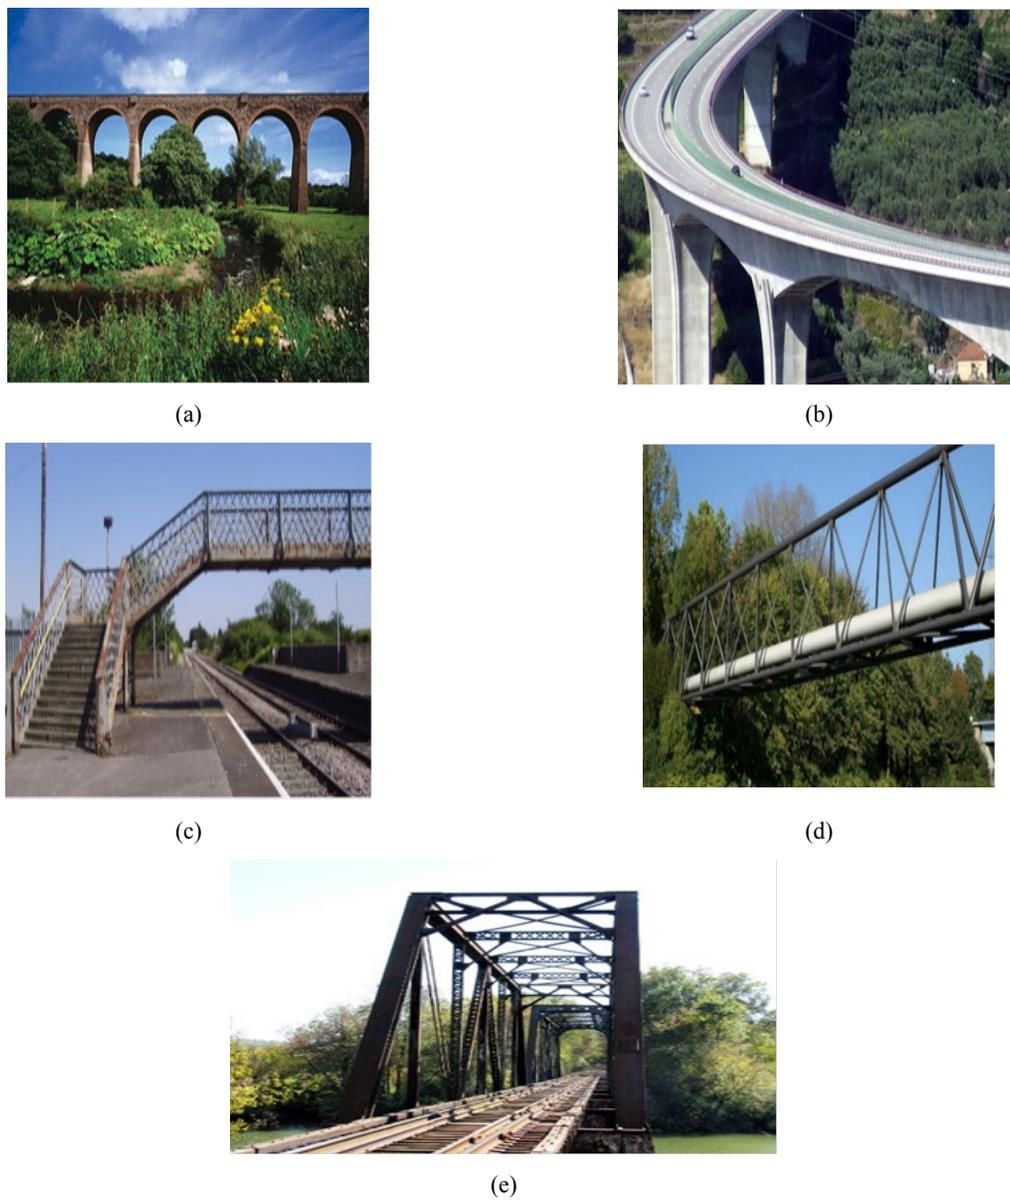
Types of bridges according to function of bridge: (a). viaduct bridge, (b). highway bridge, (c). pedestrian bridge, (d). pipe bridge, (e). railway bridge (Types of bridges based on span, materials, structures, functions, utility, etc. 2017)
